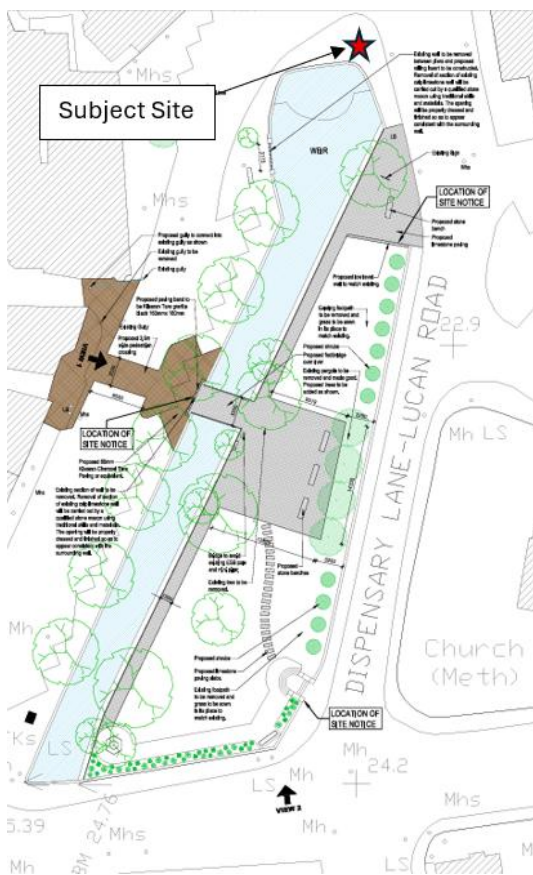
SD158/004 PROPOSED SITE PLAN (SOURCE: SDCC)
